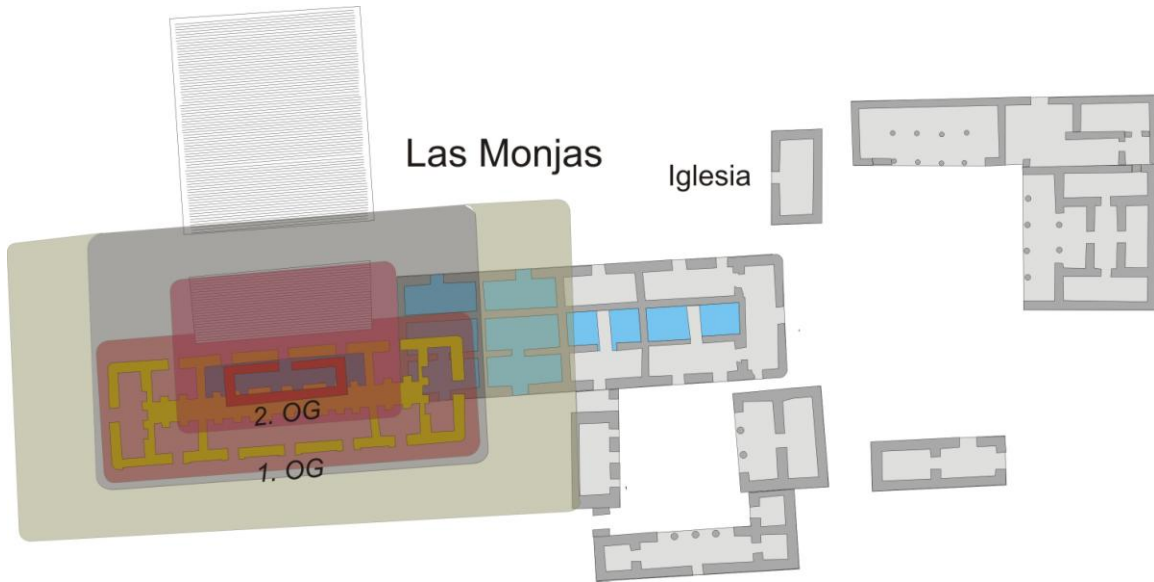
Plan view of Las Monjas, Chichen Itza (Wikimedia Commons 2009)
